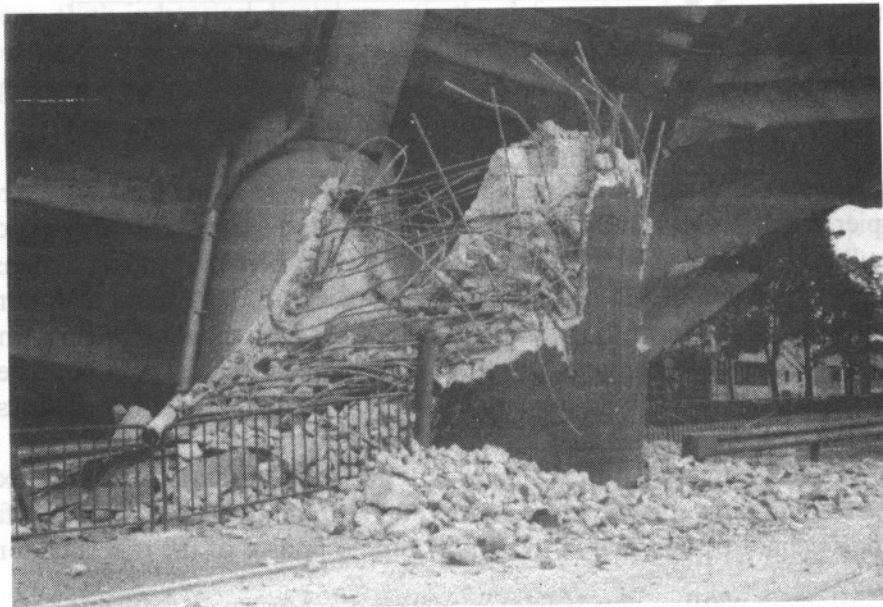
The Hanshin Viaduct - A collapsed pier.
